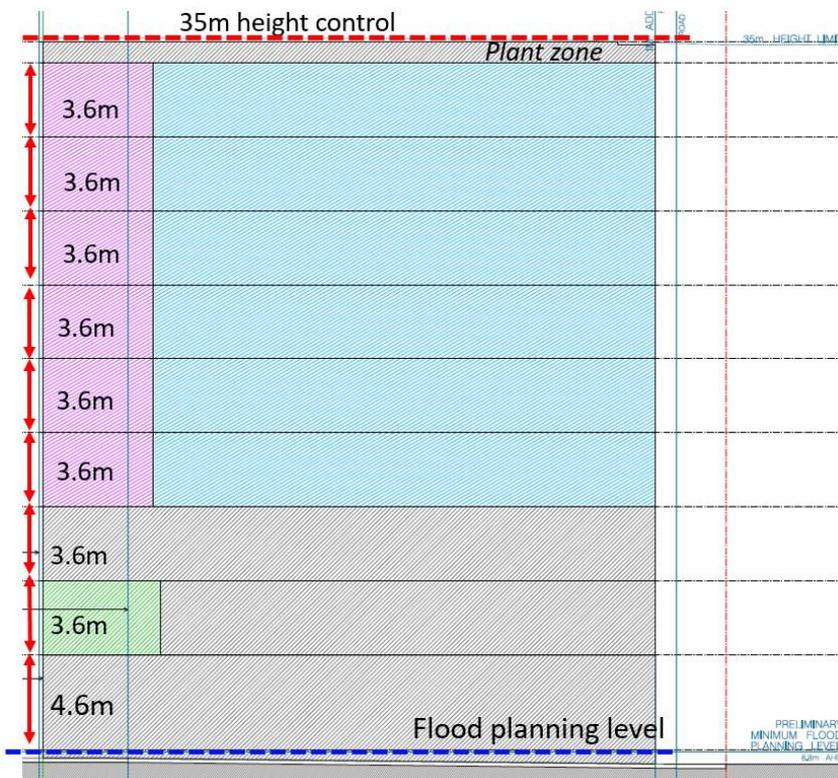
Proposed section showing compliant floor planning level and ceiling heights within the maximum permitted SLEP 2012 height control
